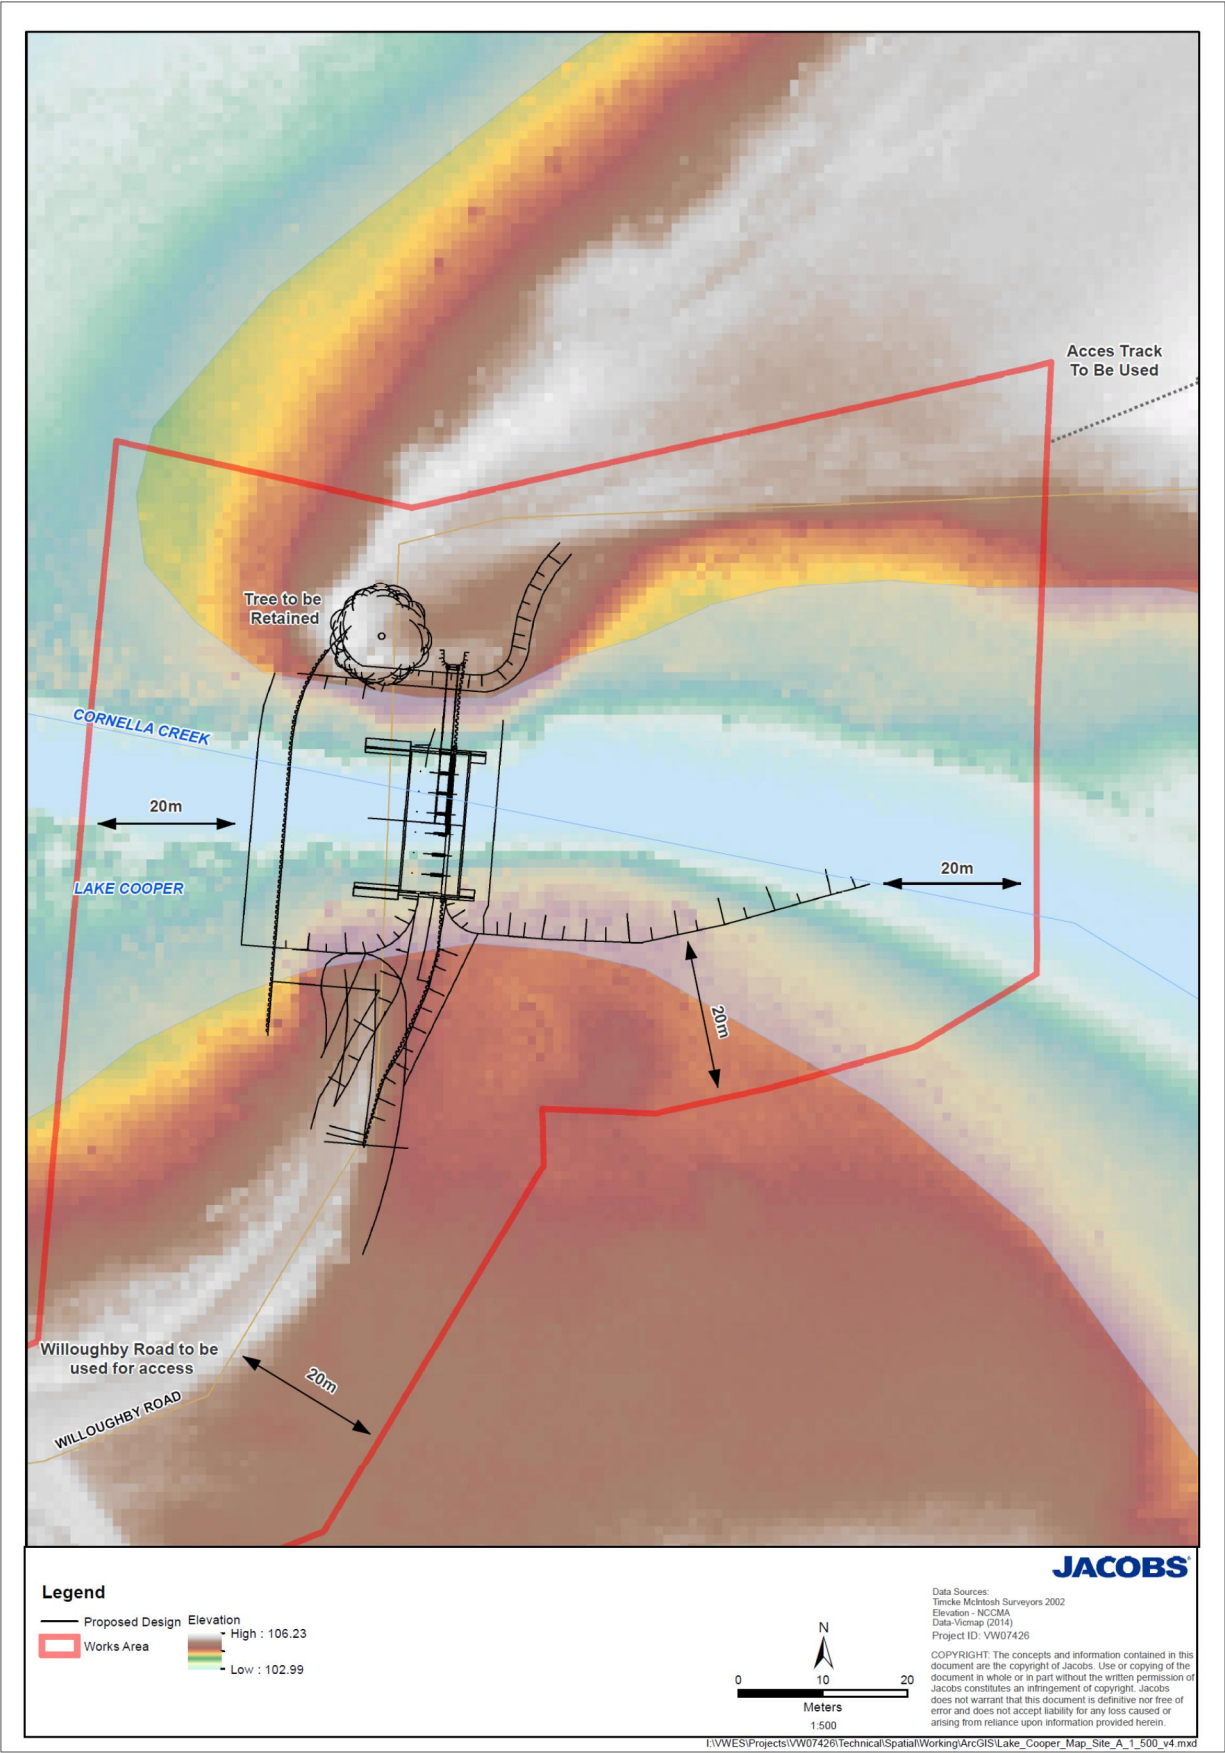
Plan view of the proposed regulator and associated works area on Cornella Creek at Willoughby Road.
